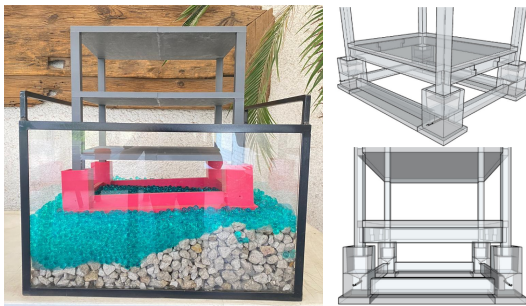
Scale model superstructure-SENFA-foundation-soil.
